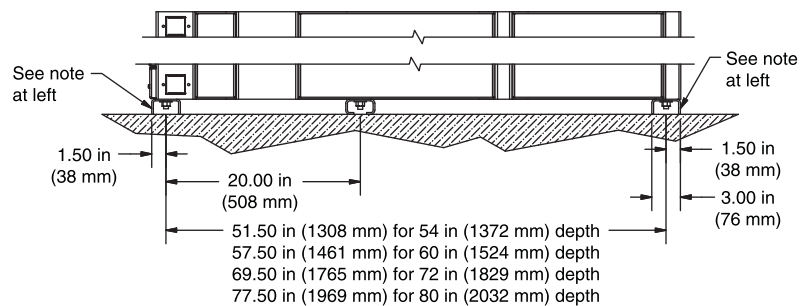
Typical Floor Plan (Side View)—Non-Seismic
